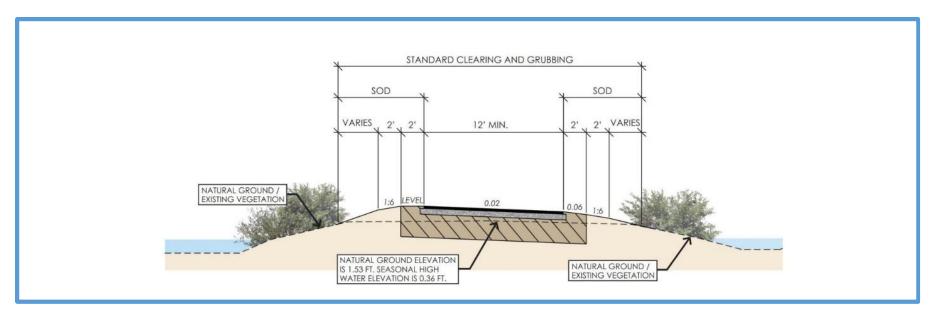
Typical Section, E-W MINWR Alternative 2 (along Dike and Pump House Service Road)
